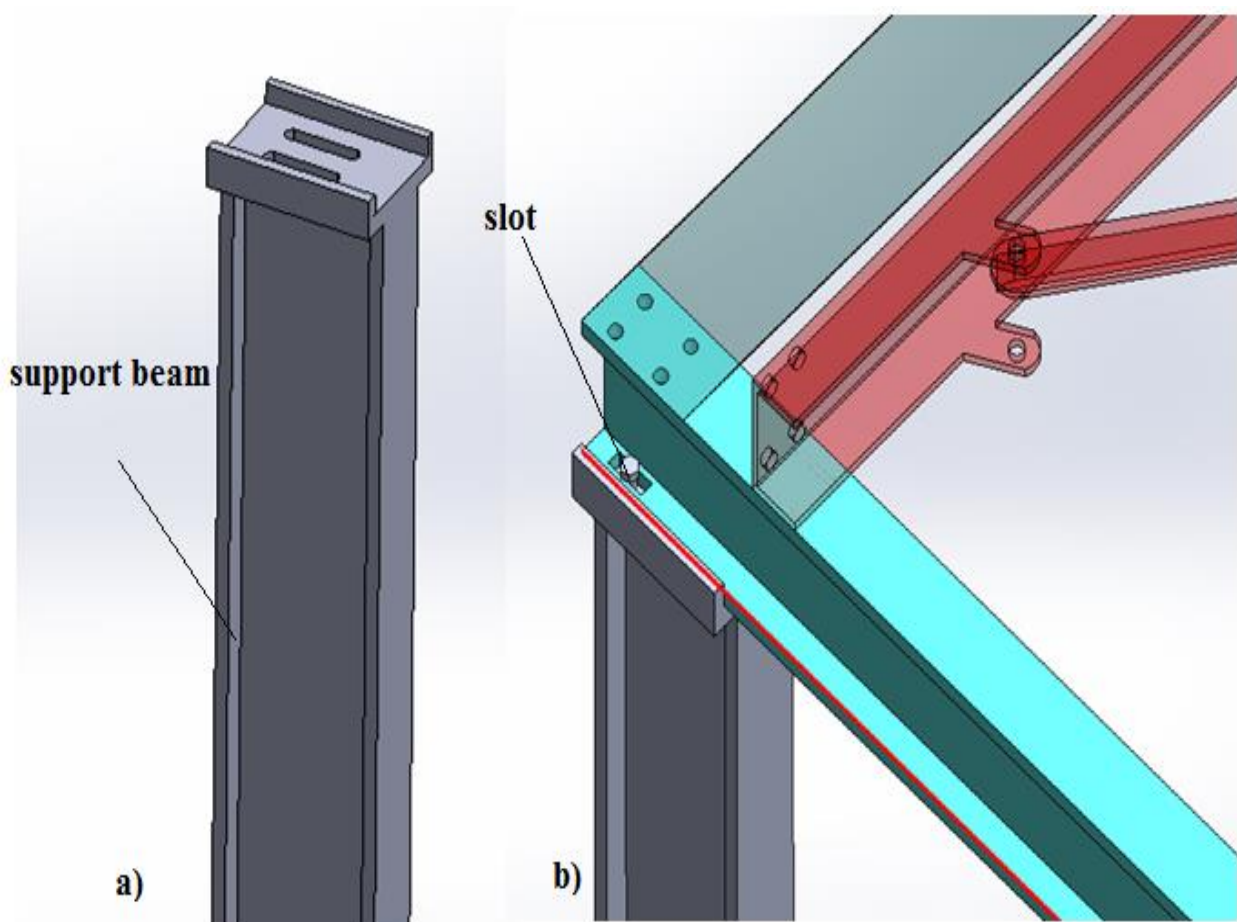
a) support beam; b) Fixing of the steel truss on the support
